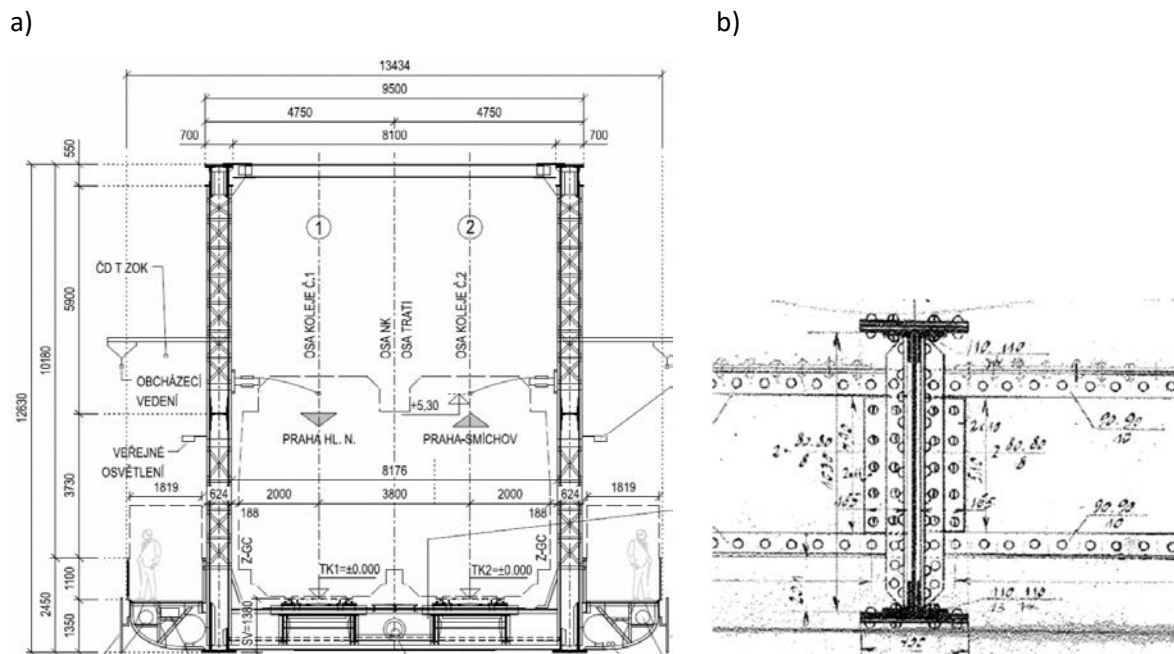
a) Cross section at mid-span of the lattice girder with transverse frame and rail-track supporting structure, b) rail-track supporting structure: floor beam to cross girder connection.
